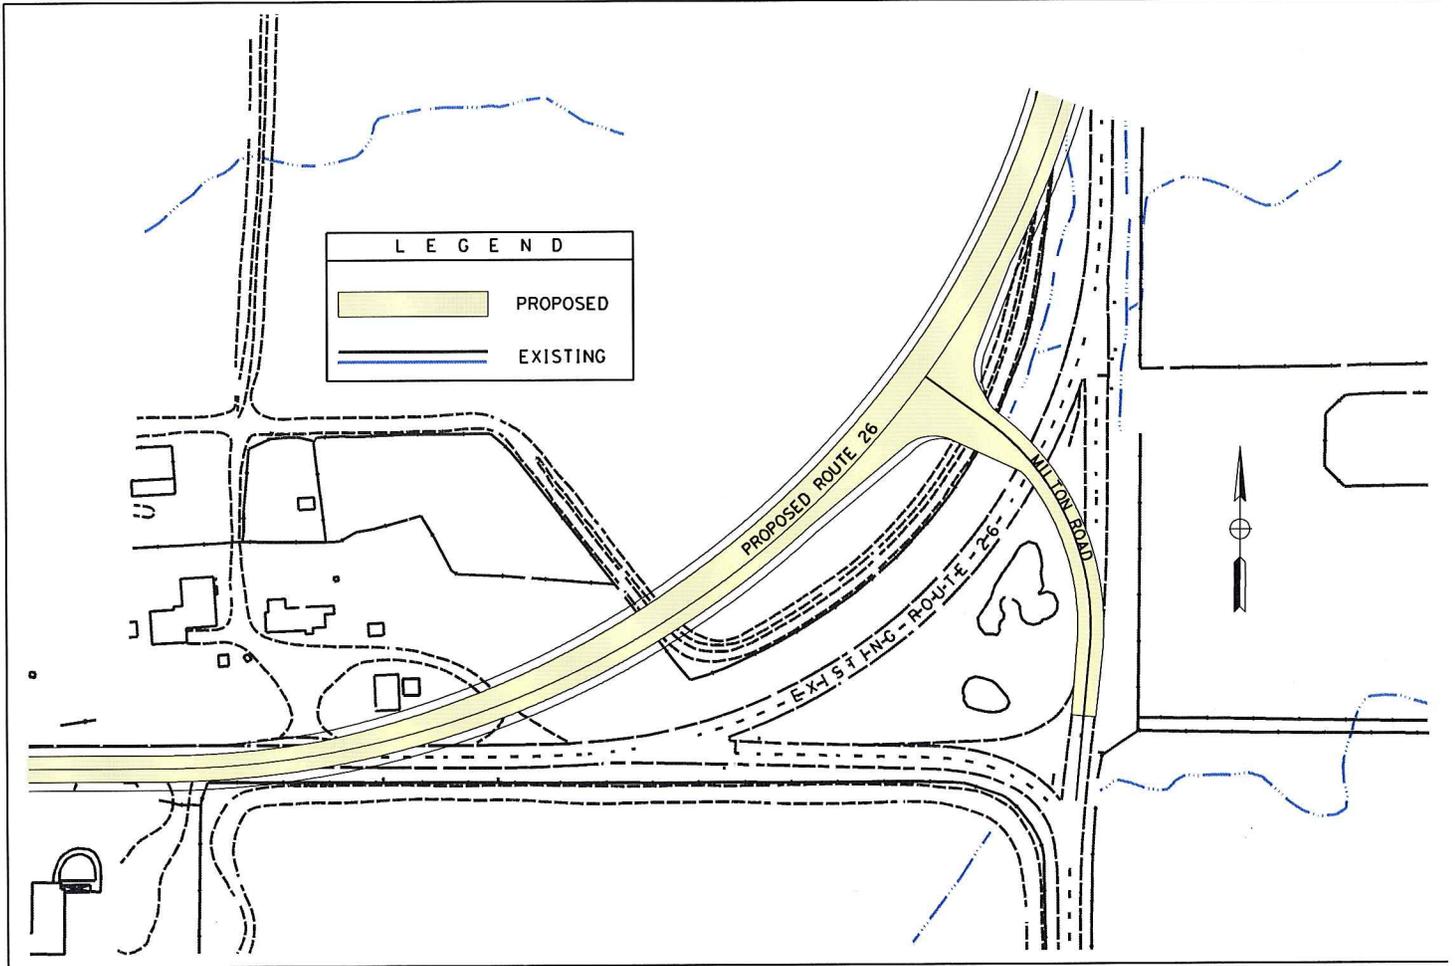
Proposed State Route 26/Milton Road Intersection
